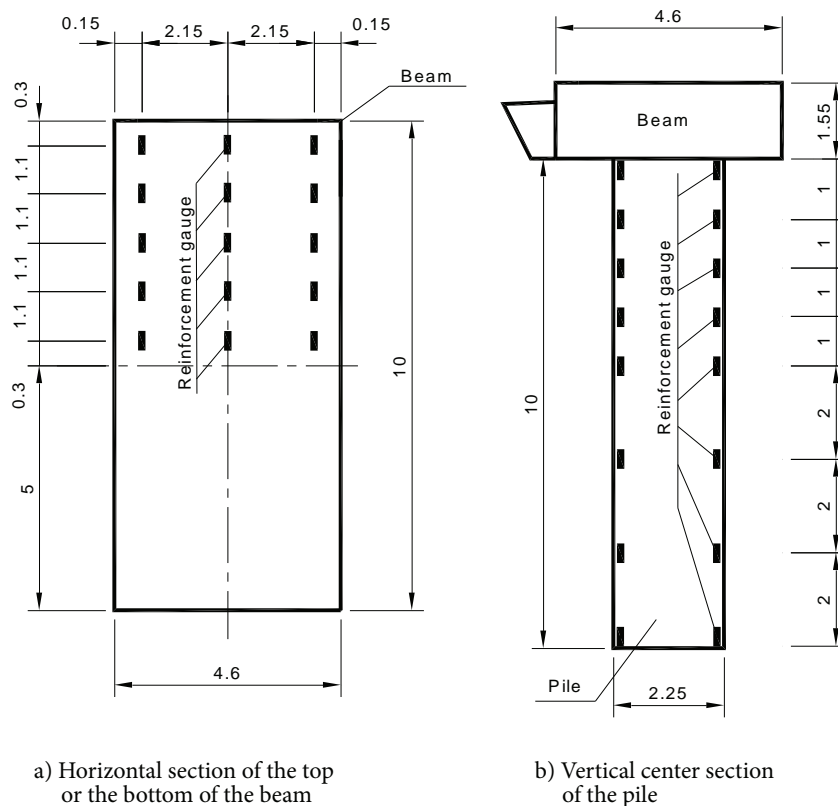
Arrangement of the reinforcement gauges on the top and at the bottom of the beam and the vertical center section of the pile (all units in meters).
